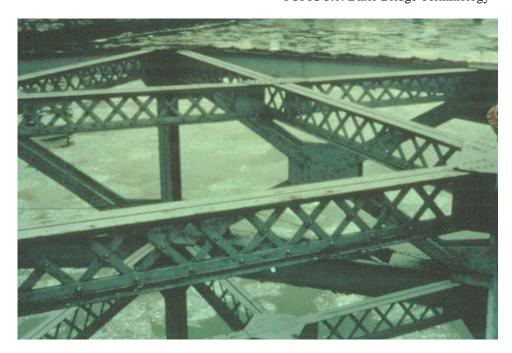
Bracing Members Made from Angles, Bars, and Plates
